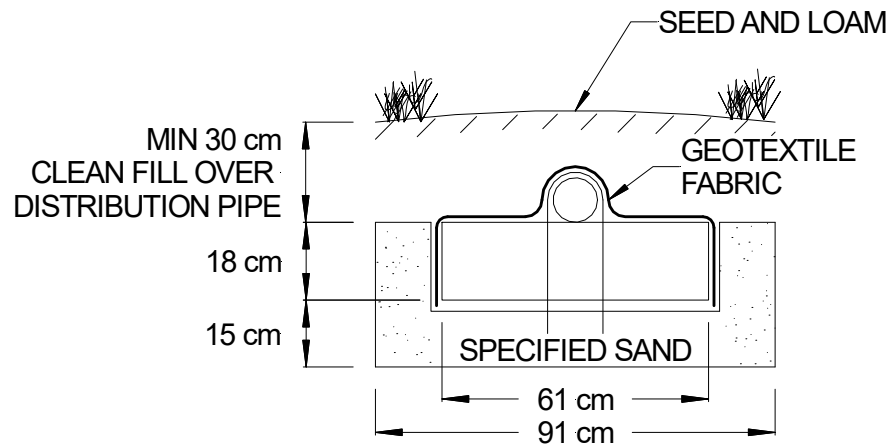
TYPICAL A42 GSF CROSS SECTION
